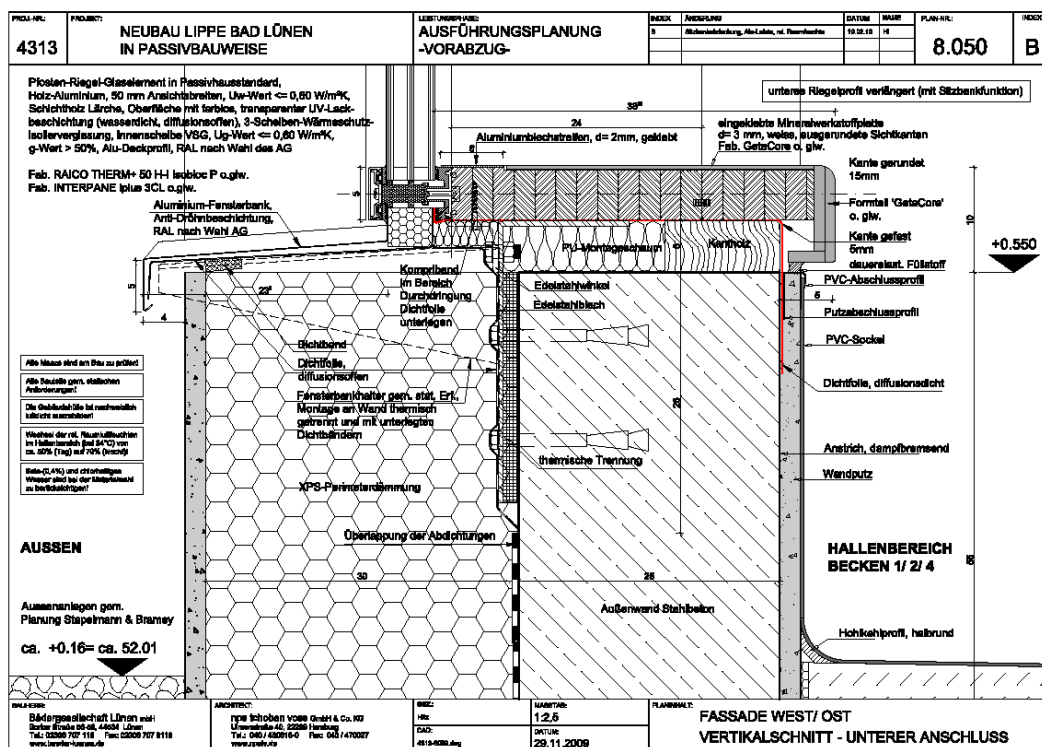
Detail of vertical section of glass facade / parapet in the area of the outer wall (source: ntspv)
